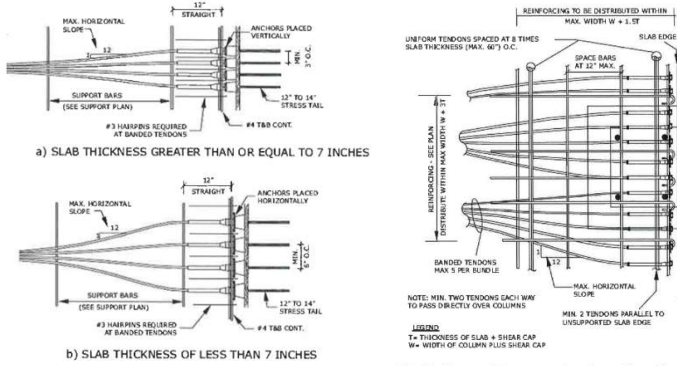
Horizontal flare of tendons at anchorage zone.
